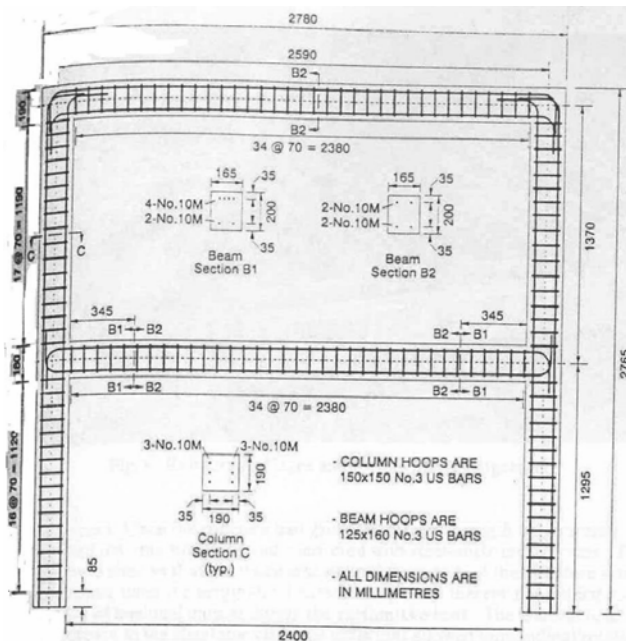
31: Reinforced steel layout of structure #2 frames from [40]
